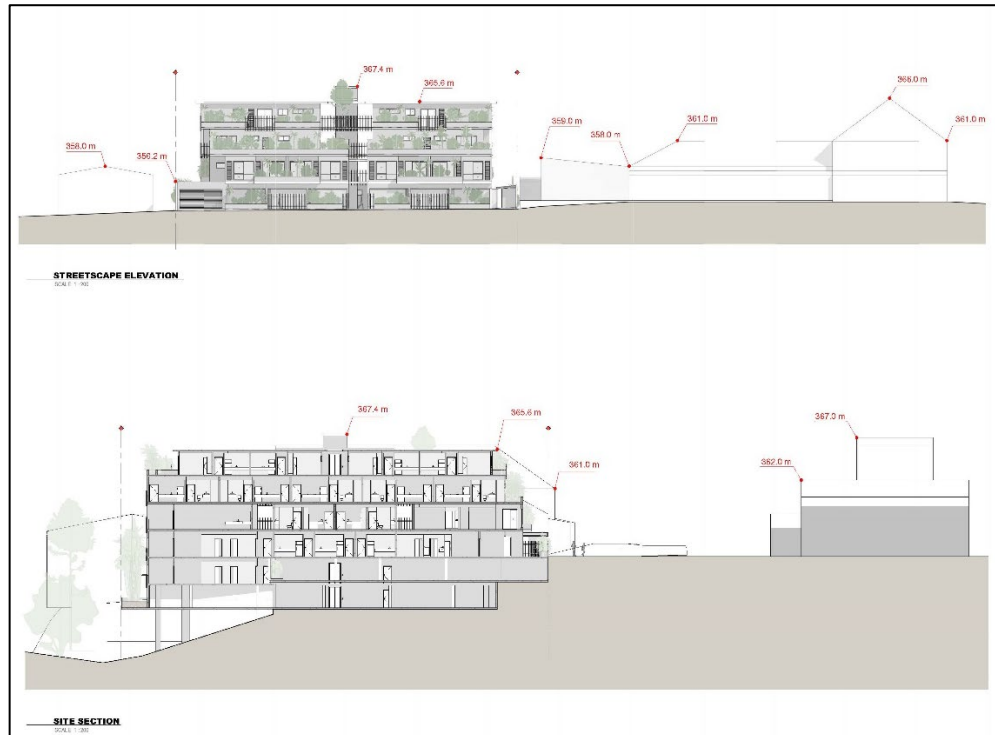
Streetscape Elevation (Source: TP13 from Plans of Development)
